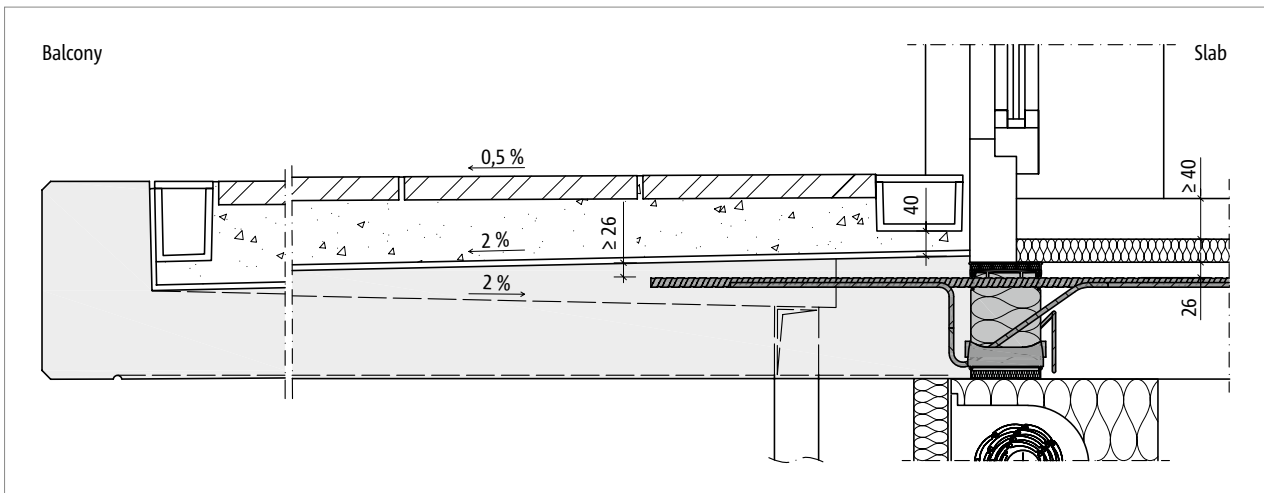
Schöck Isokorb® CXT type K-E-REI120: Precast unit with flooring material and channel for fire protection class REI 90
